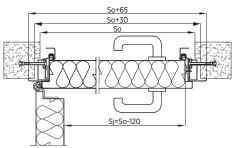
Installation of a single-leaf door to a masonry wall – corner frame with a thermal break – horizontal cross-section
